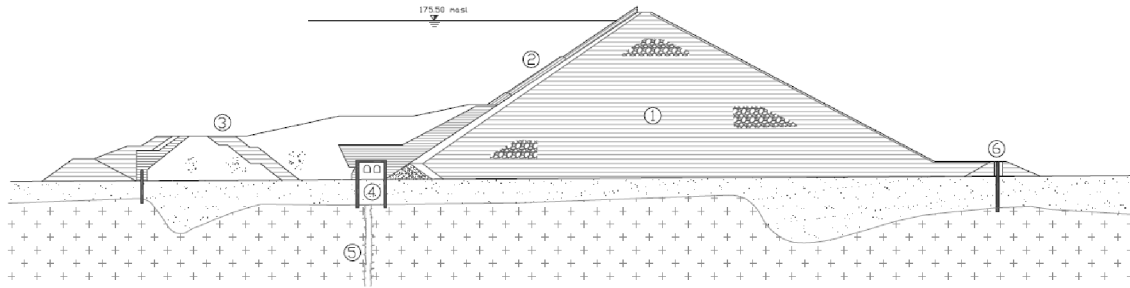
Cross section of Koman Dam. □: rockfill dam, □: concrete slabs, - : previous upstream coffer dam, ||: control galleries, - : groutcurtain, - : previous downstream coffer dam
